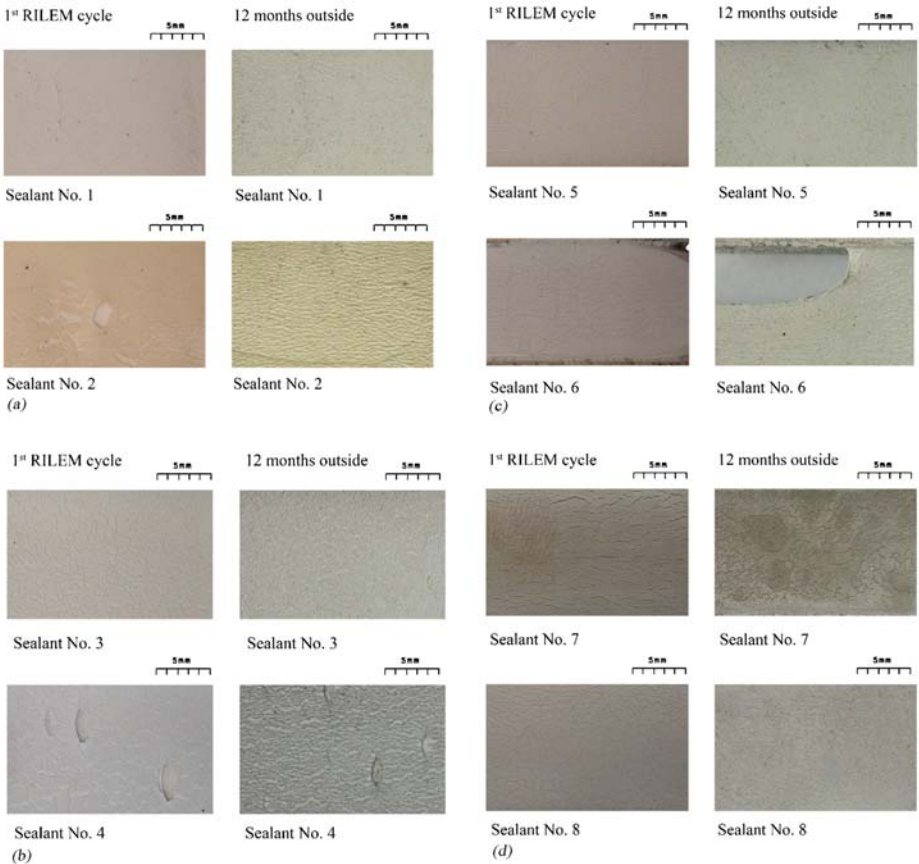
(a) Appearance of joints specimens for 25 LM Sealant No. 1 and No. 2 after first RILEM aging cycle and twelve months of outdoor exposure (joints extended by 100 %). (b) Appearance of joints specimens for 25 LM Sealant No. 3 and No. 4 after first RILEM aging cycle and twelve months of outdoor exposure (joints extended by 100 %). (c) Appearance of joints specimens for HM Sealant No. 5 and No. 6 after first RILEM aging cycle and twelve months of outdoor exposure (joints extended by 25 %). (d) Appearance of joints specimens for HM Sealant No. 7 and No. 8 after first RILEM aging cycle and twelve months of outdoor exposure (joints extended by 25 %).
